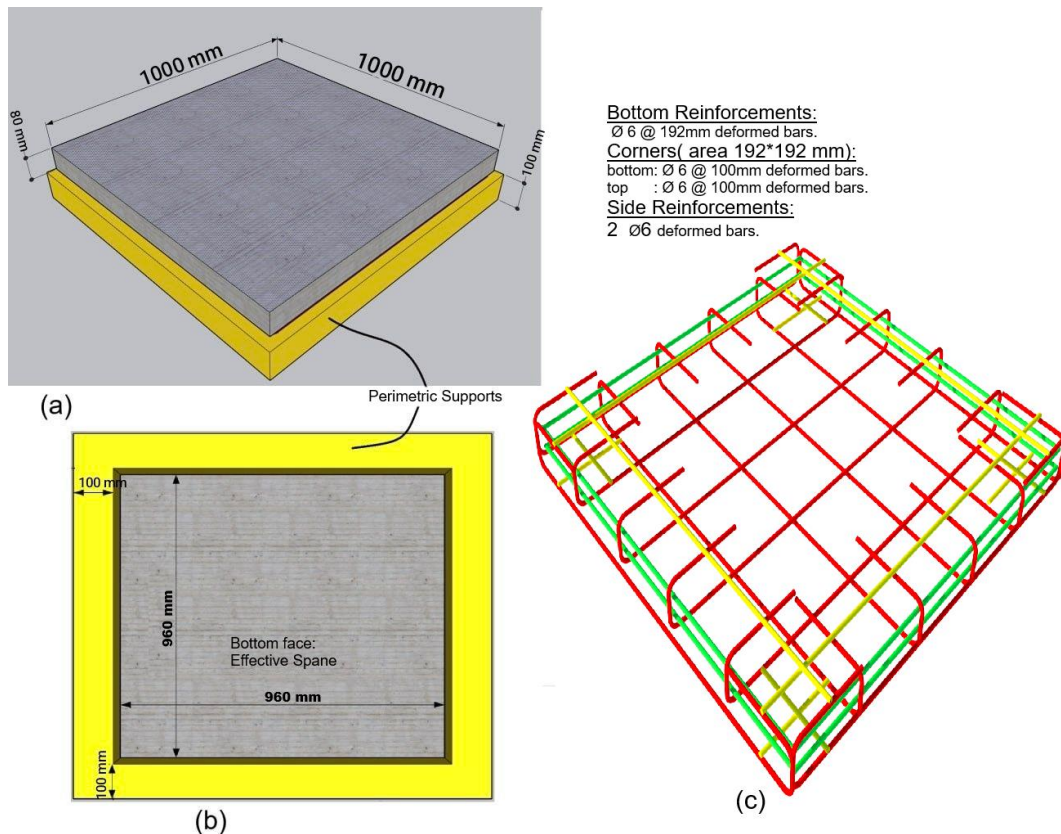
(a) The slab's geometry; (b) the slab's perimeter-supported bottom face; and (c) the slab's steel reinforcement details
